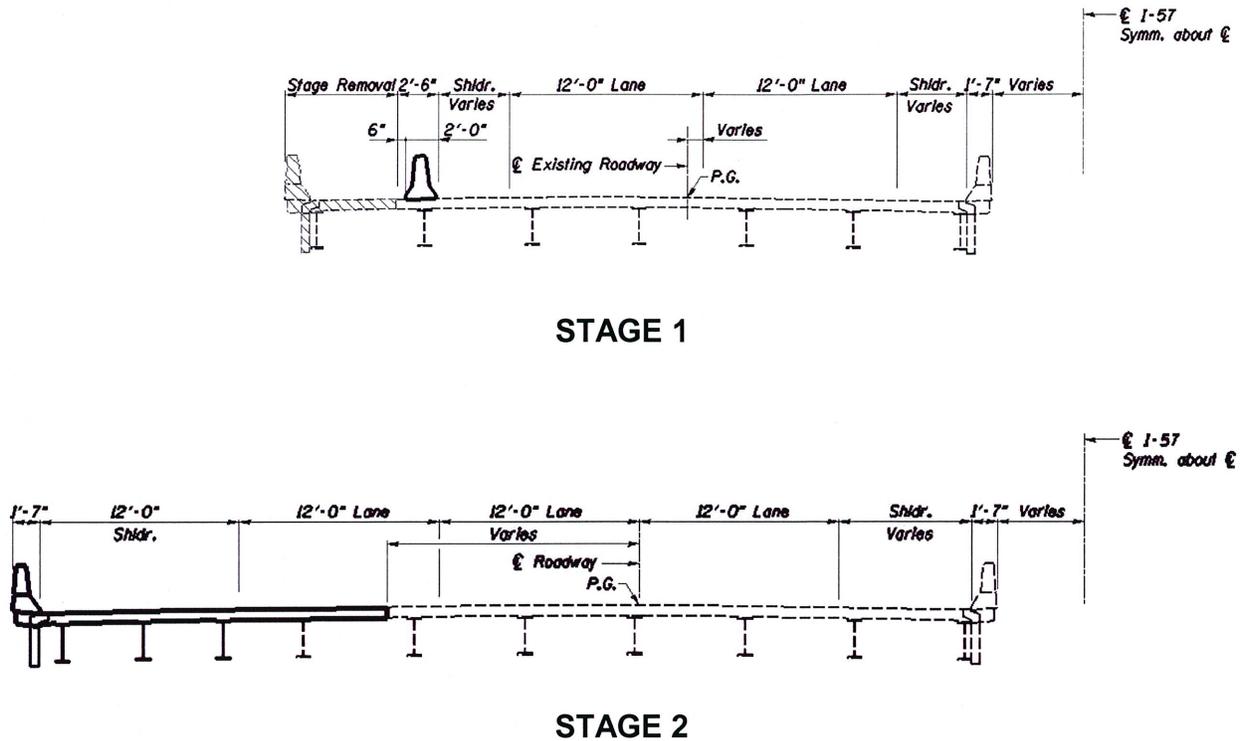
BRIDGE TYPICAL SECTION –OUTSIDE WIDENING
